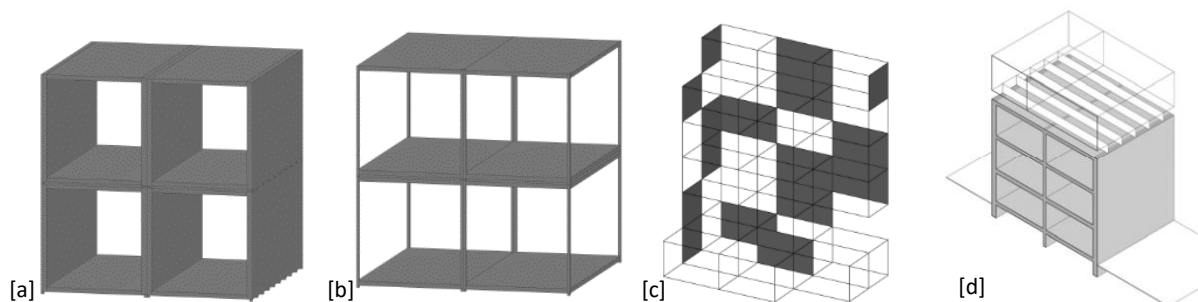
Modular construction principles; [a] Load-bearing wall module; [b] Corner supported module; [c] Hybrid module (Hamelijnck, 2021); [d] Structural interlayer (Tulamo et al., 2014)
